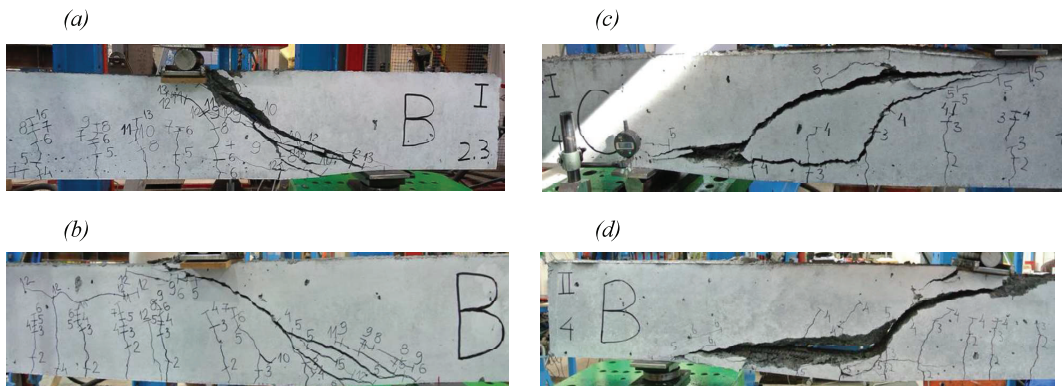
Final failure state of beams (a) 2.3-1; (b) 2.3-2; (c) 4.0-1 and (d) 4.0-2
